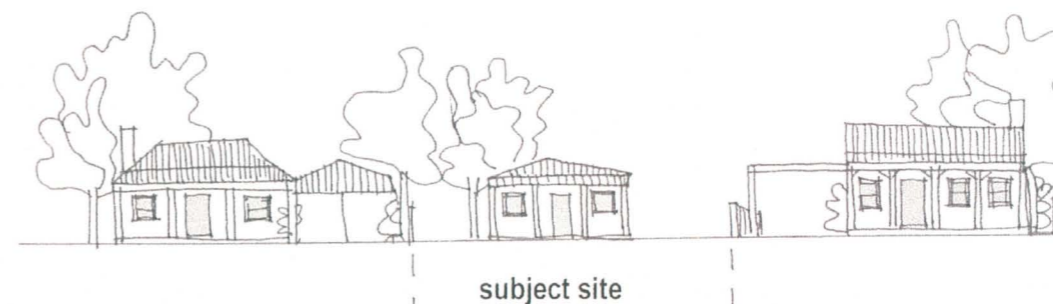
Bad example of infill, substantially smaller than adjacent heritage buildings.
